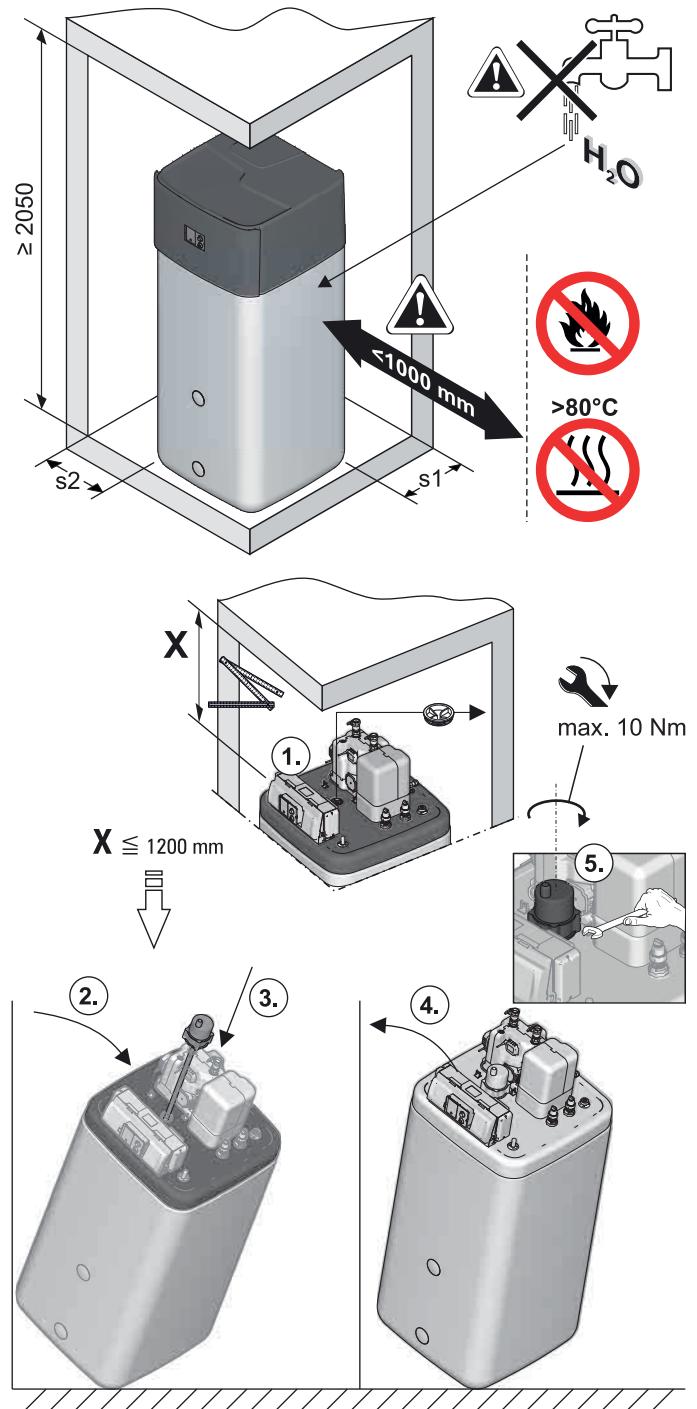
Layout (shown on ROTEX HPSU compact 508/516 with incorporation of the optional Backup Heater)
